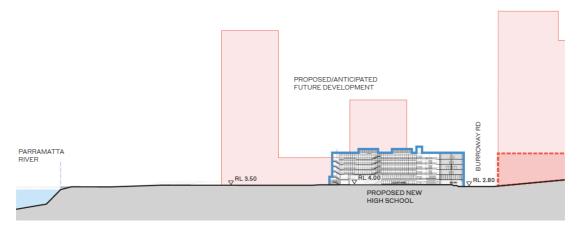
Burroway Road elevation Source: Woods Bagot
